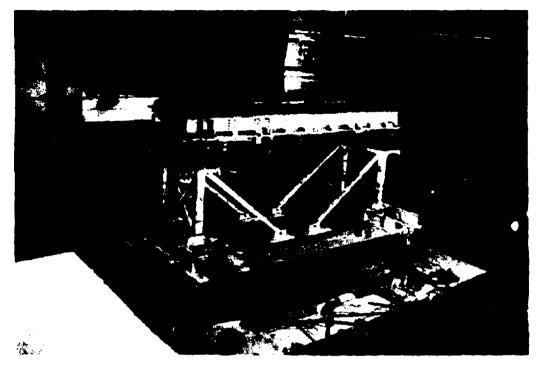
View of Bridge Model in Configuration with Two Stiff Piers
